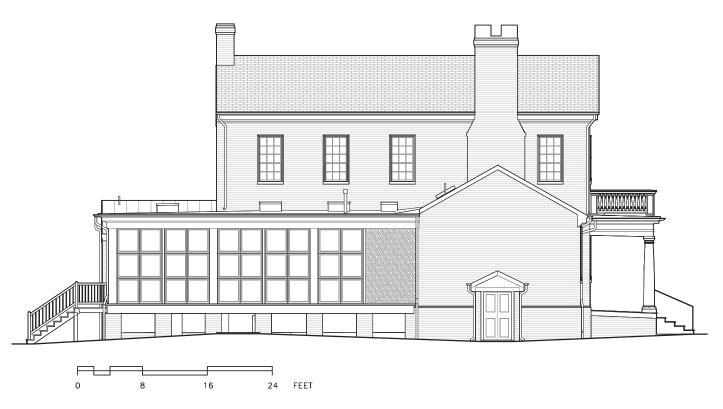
Oak Lawn south elevation. JGWA, 2024.
